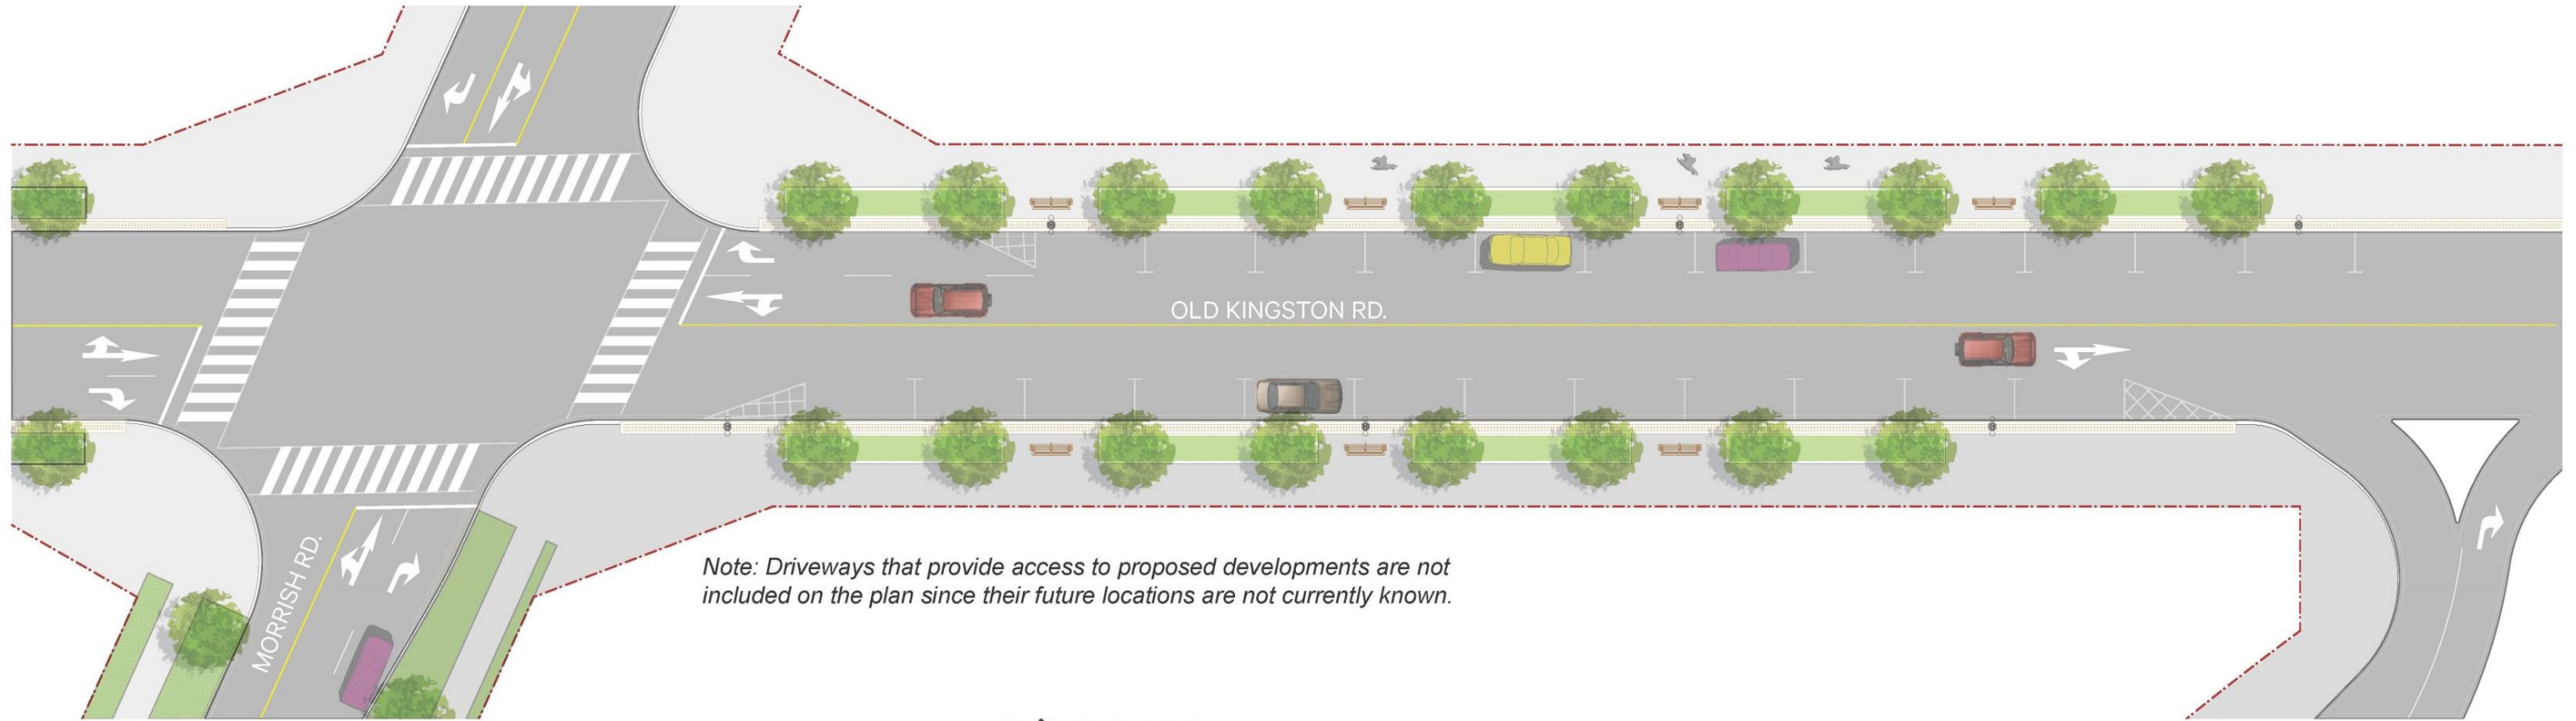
Typical Section for Schedule A+ Project: Old Kingston Road Streetscape (East of Morrish Road)
